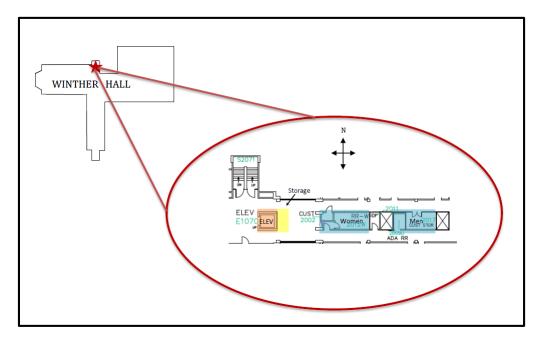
Zoomed-in View of Limited Construction Floor Plan
